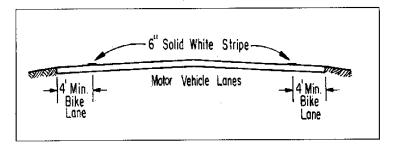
Typical Roadway in Outlying Areas Parking Restricted Source: CALTRANS
